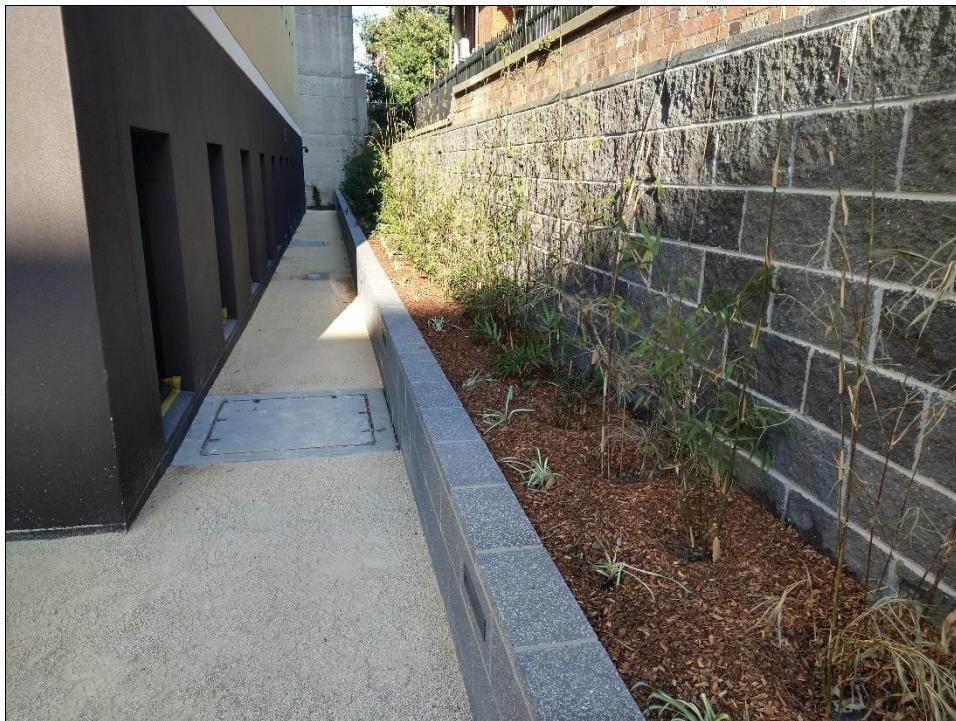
Looking east at garden bed and walkway along southern side of Student Accommodation Building (20 August 2021)
